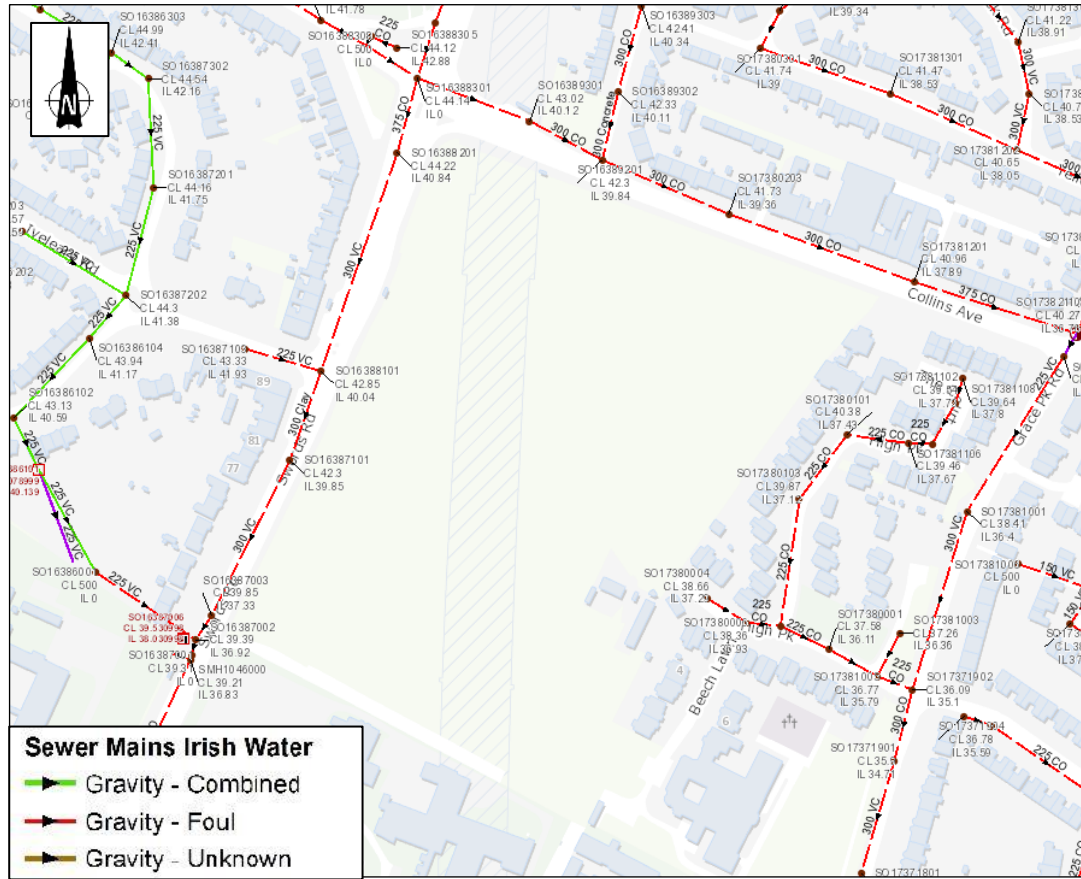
Existing Foul Drainage in the Vicinity of the Swords Road site (Irish Water Records)
